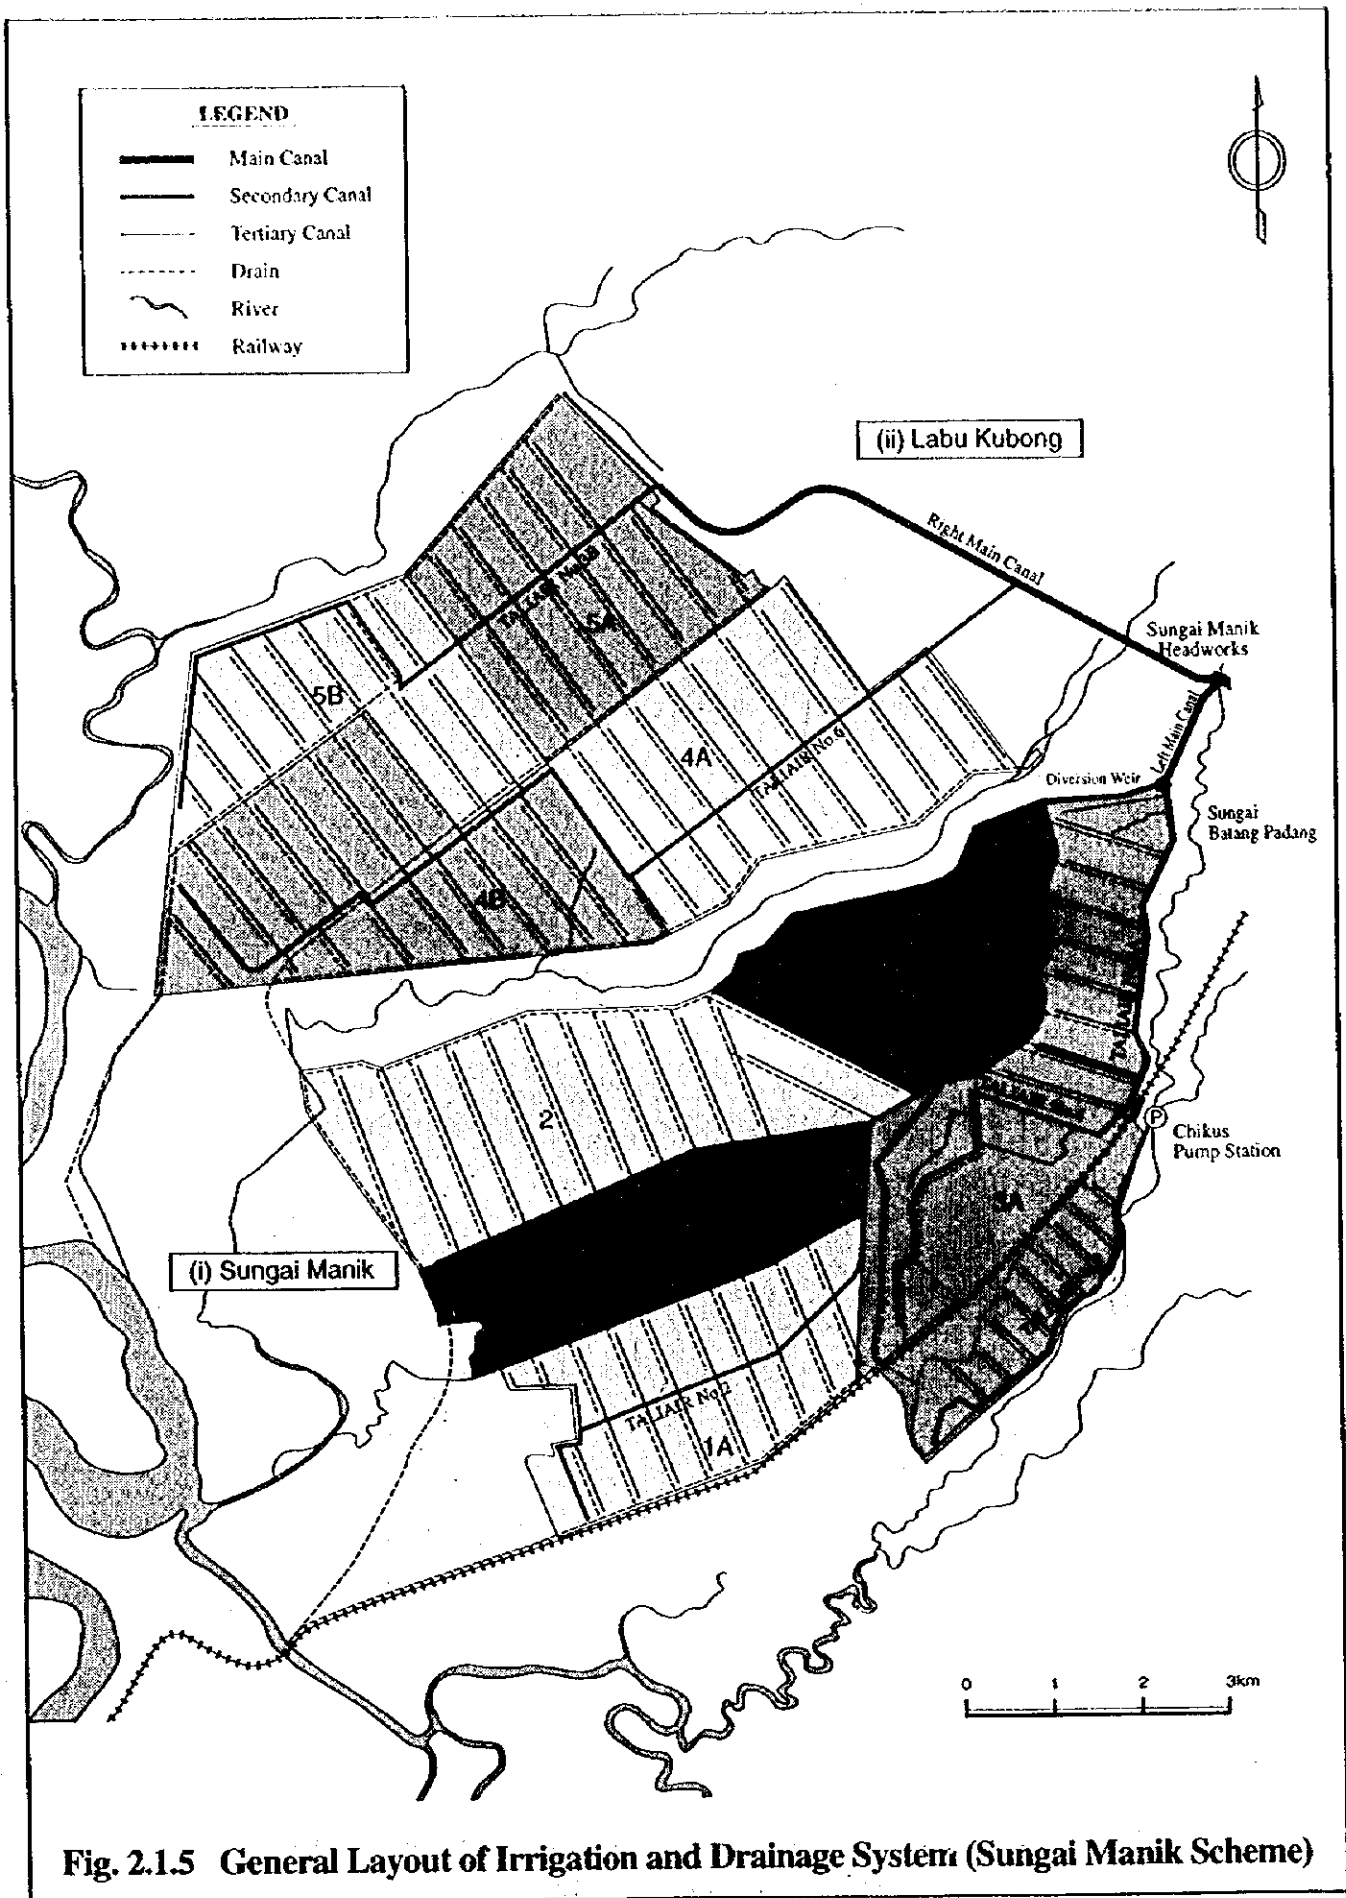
General Layout of Irrigation and Drainage System (Sungai Manik Scheme)
